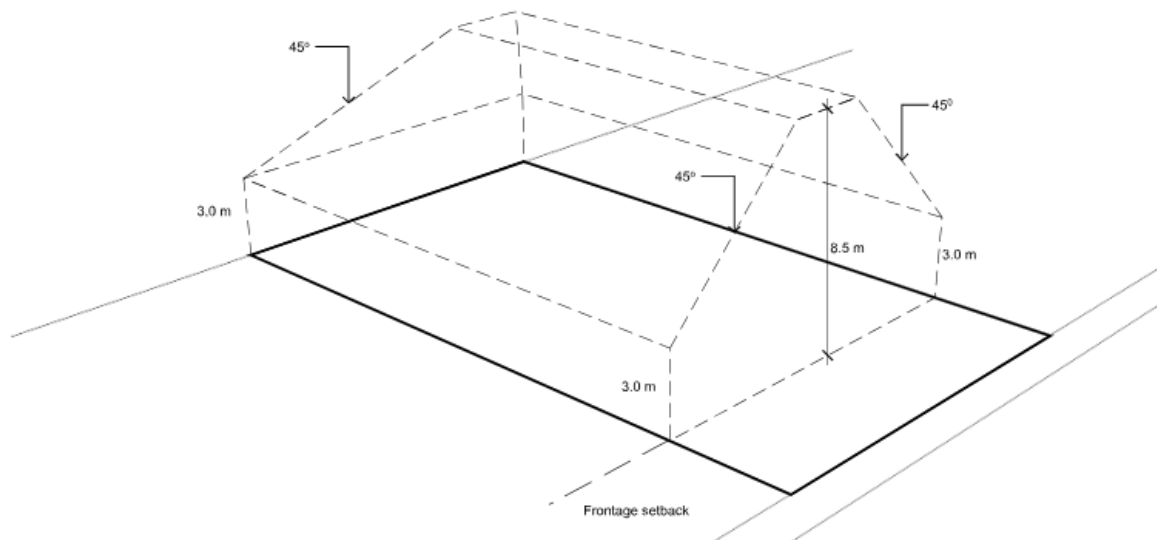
Figure 8.2 Building Envelope as required by clause 8.4.2 A3(a) (Source - Tasmanian Planning Scheme Brighton)
